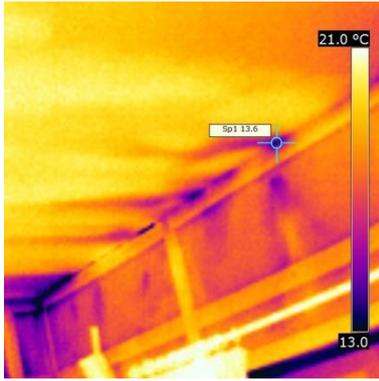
Downstairs ceiling: cold air from the soffits is penetrating between the floor and ceiling. No sealing of this area had been carried out. The room had wood panelling around the walls; cold air passing behind this can also be seen
